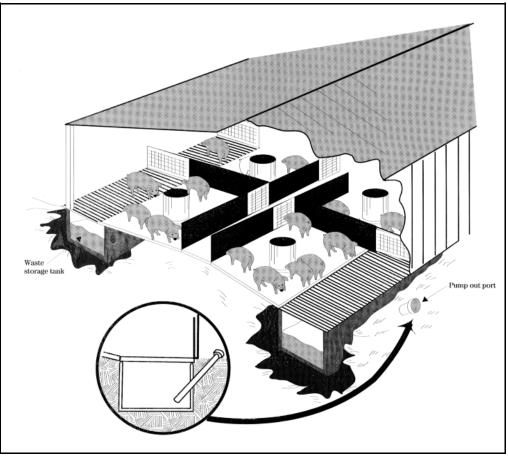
Fed hogs in confined area with concrete floor and tank storage liquid manure handling (from USDA NRCS, 1996).
